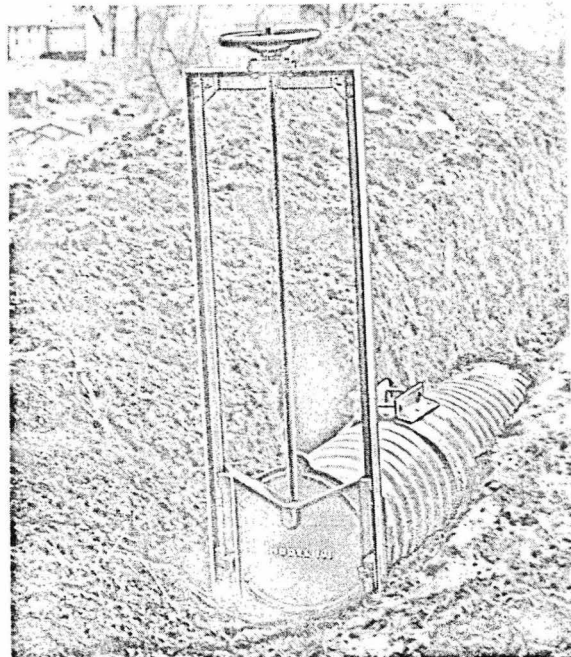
Cast iron gate in steel frame for low pressures. This gate may be attached to steel pipe or placed against a wall. It also is usable on the sloping face of a dam.
